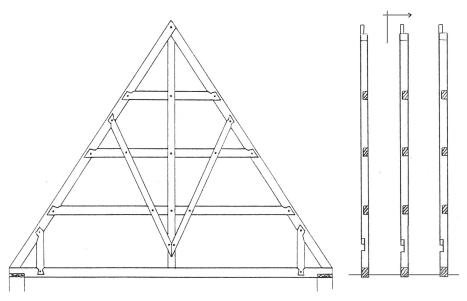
Roof structure of the church in Lubiszewo/Liebschau
